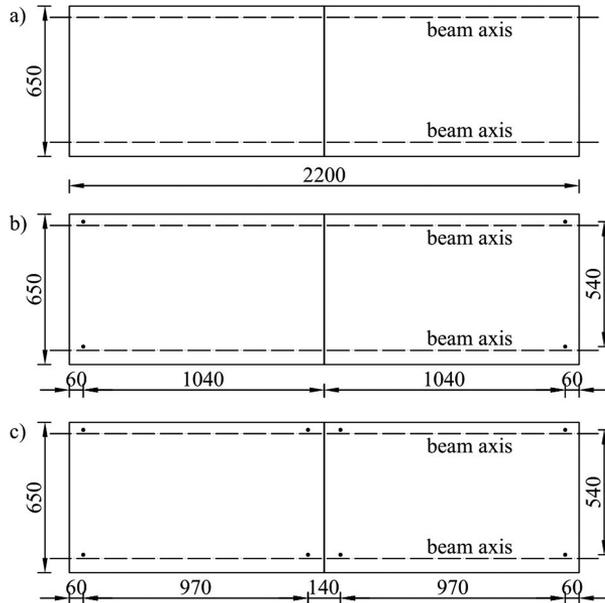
Fasteners arrangement (view from above): a) 0 fasteners, b) 4 fasteners, c) 8 fasteners
